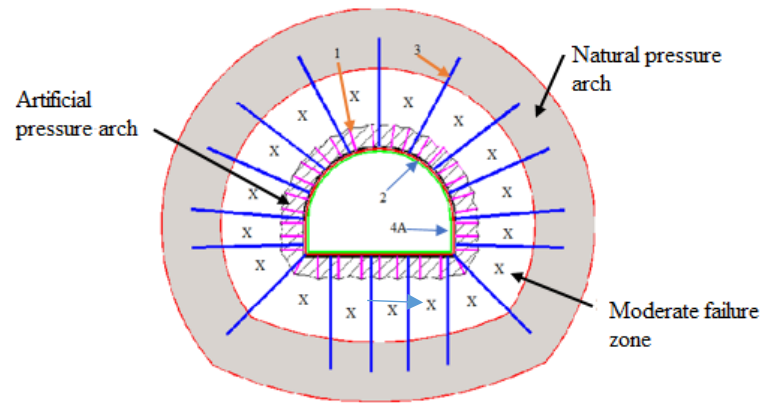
The characteristic of a reinforced zone by short rock bolts combined with long rock bolts (cable bolts) around roadways: 1 - the short bolts under level; 2 - shotcrete layers; 3 - the long rock bolts; 4A - final (permanent) support layers.
